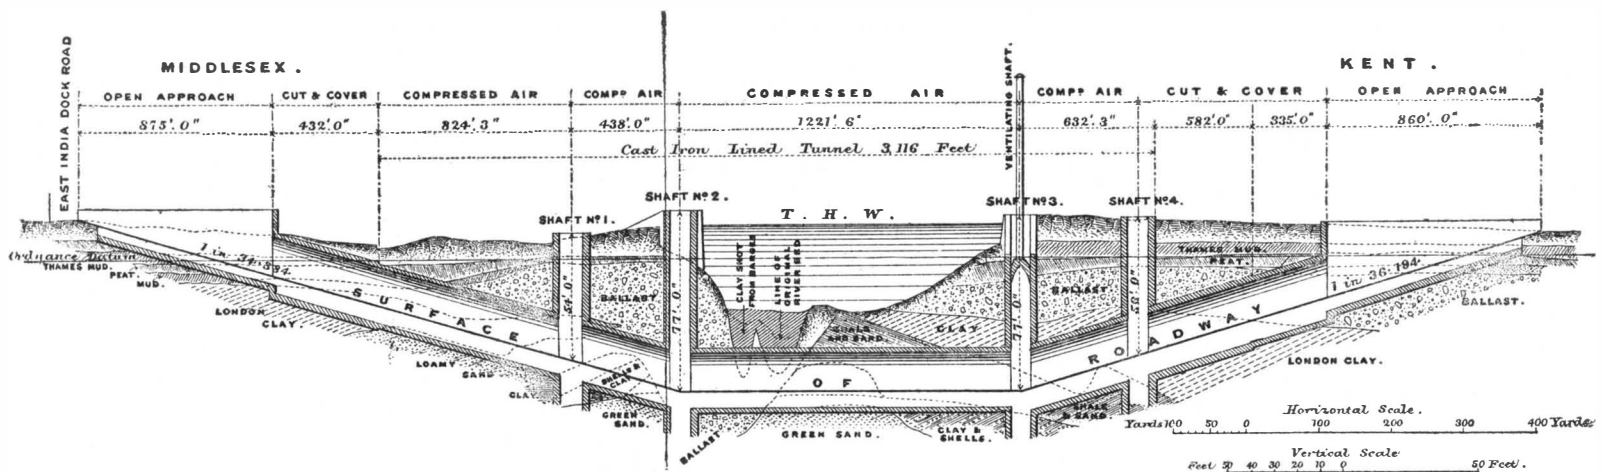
LONGITUDINAL SECTION ON CENTER LINE OF TUNNEL.
